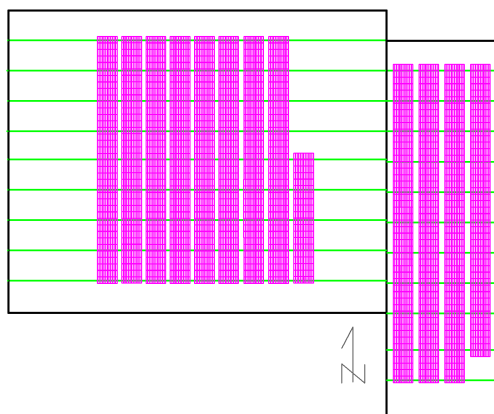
Rooftop layout of 245KWp CIS array in Camarillo, California. The 6144 ST40 modules are deployed in thirteen rows facing west across two adjacent roof sections
